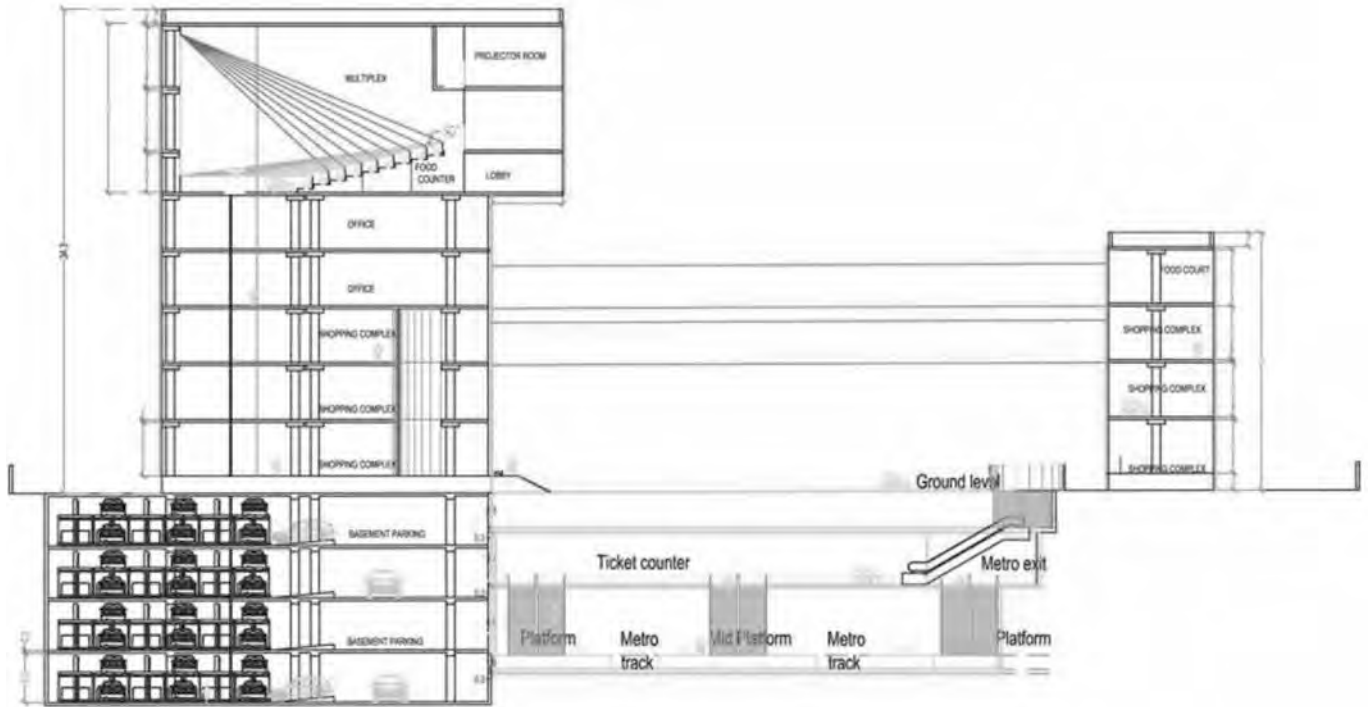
Section showing the two block of shopping complex with the underground metro station and basement car parking
